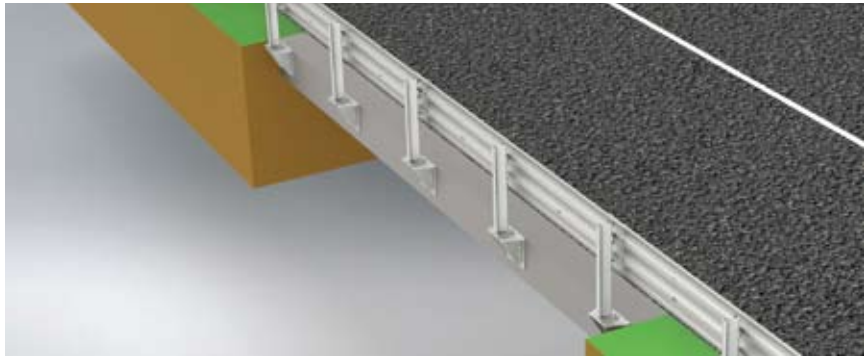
Ingal Elevated Barrier Installation Tolerances
